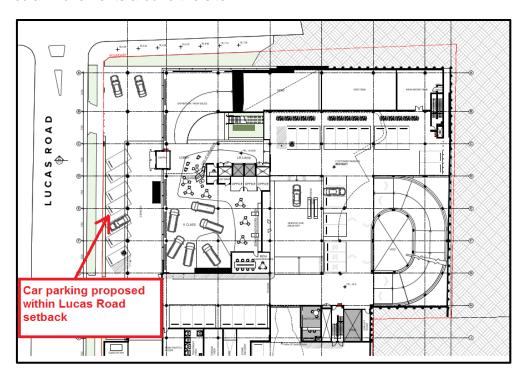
Marked ground floor plan indicating proposed car parking spaces within the Lucas Road setback (Source: Turner / Marked: James Arnold)
